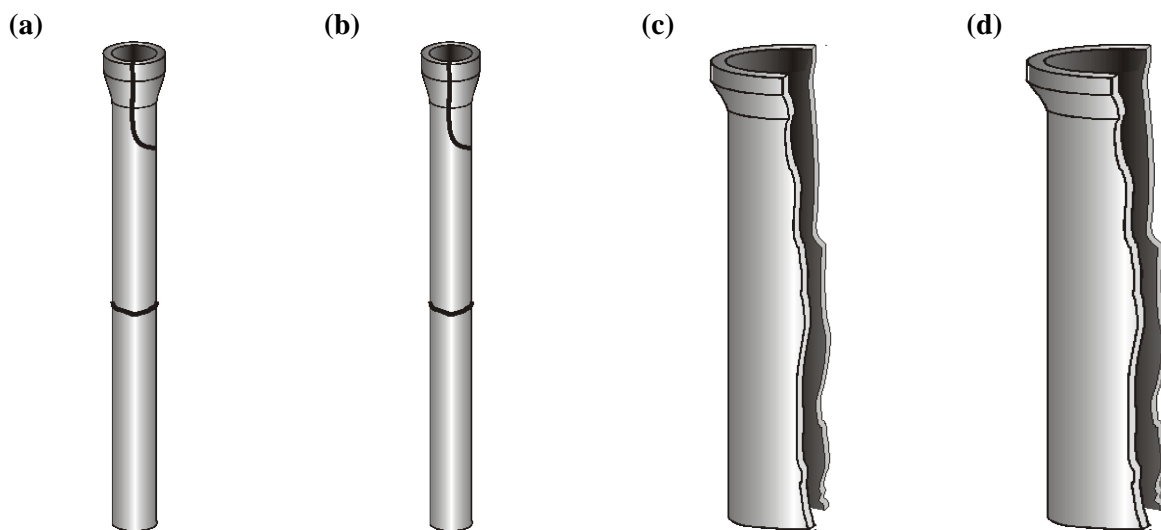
Different failure modes seen in cast iron pipe: (a) bell split and circumferential failure, (b) blow out and through wall corrosion, (c) longitudinal failure and (d) bell shear.
